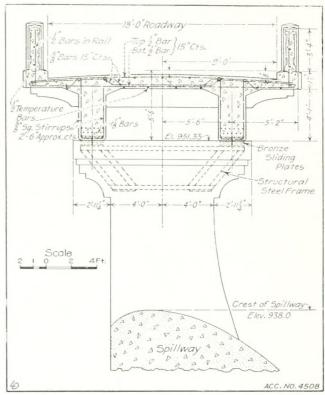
CROSS SECTION OF THE LOCKINGTON SPILLWAY BRIDGE.
